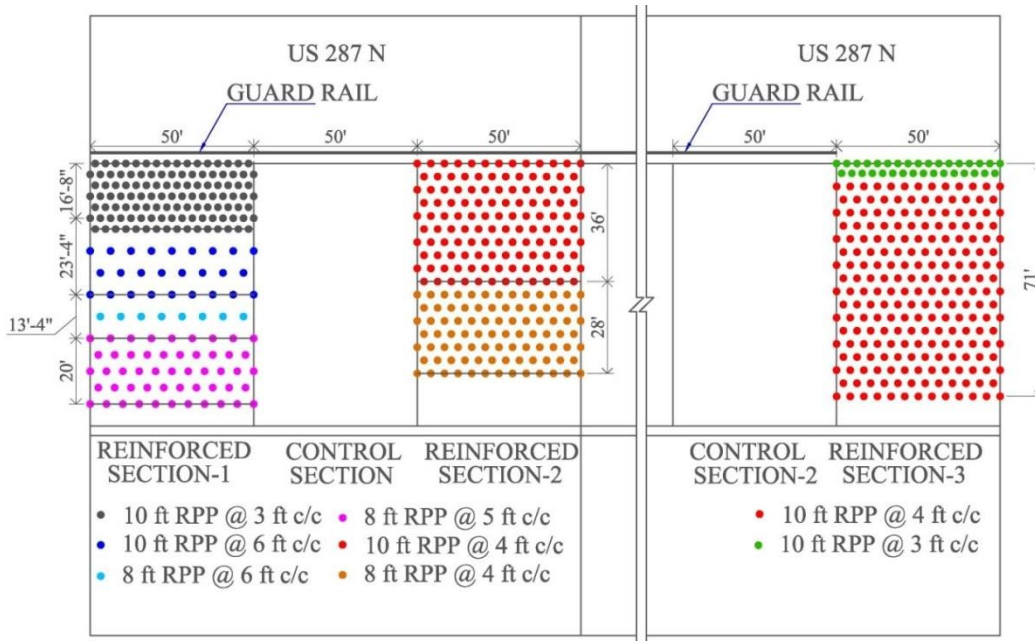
RPP layout at US 287 slope (Khan, 2013)
